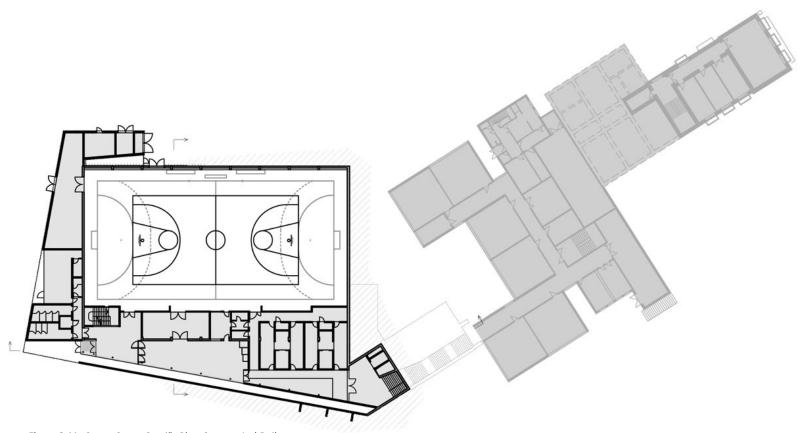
Sports Center Stopiče Plan. Source : ArchDaily
